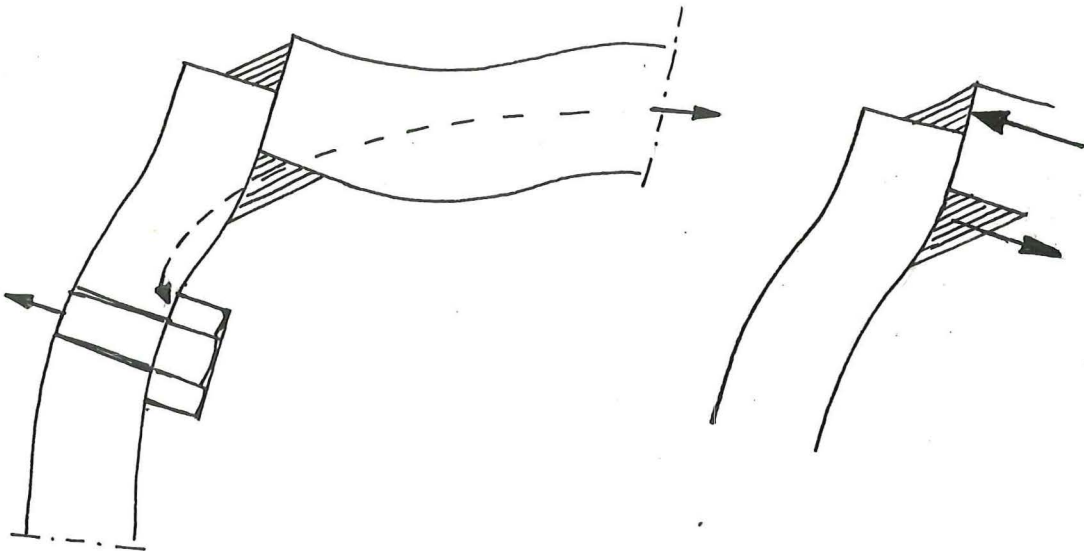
Bending of the end plate causes bending of the inner fillet weld.
